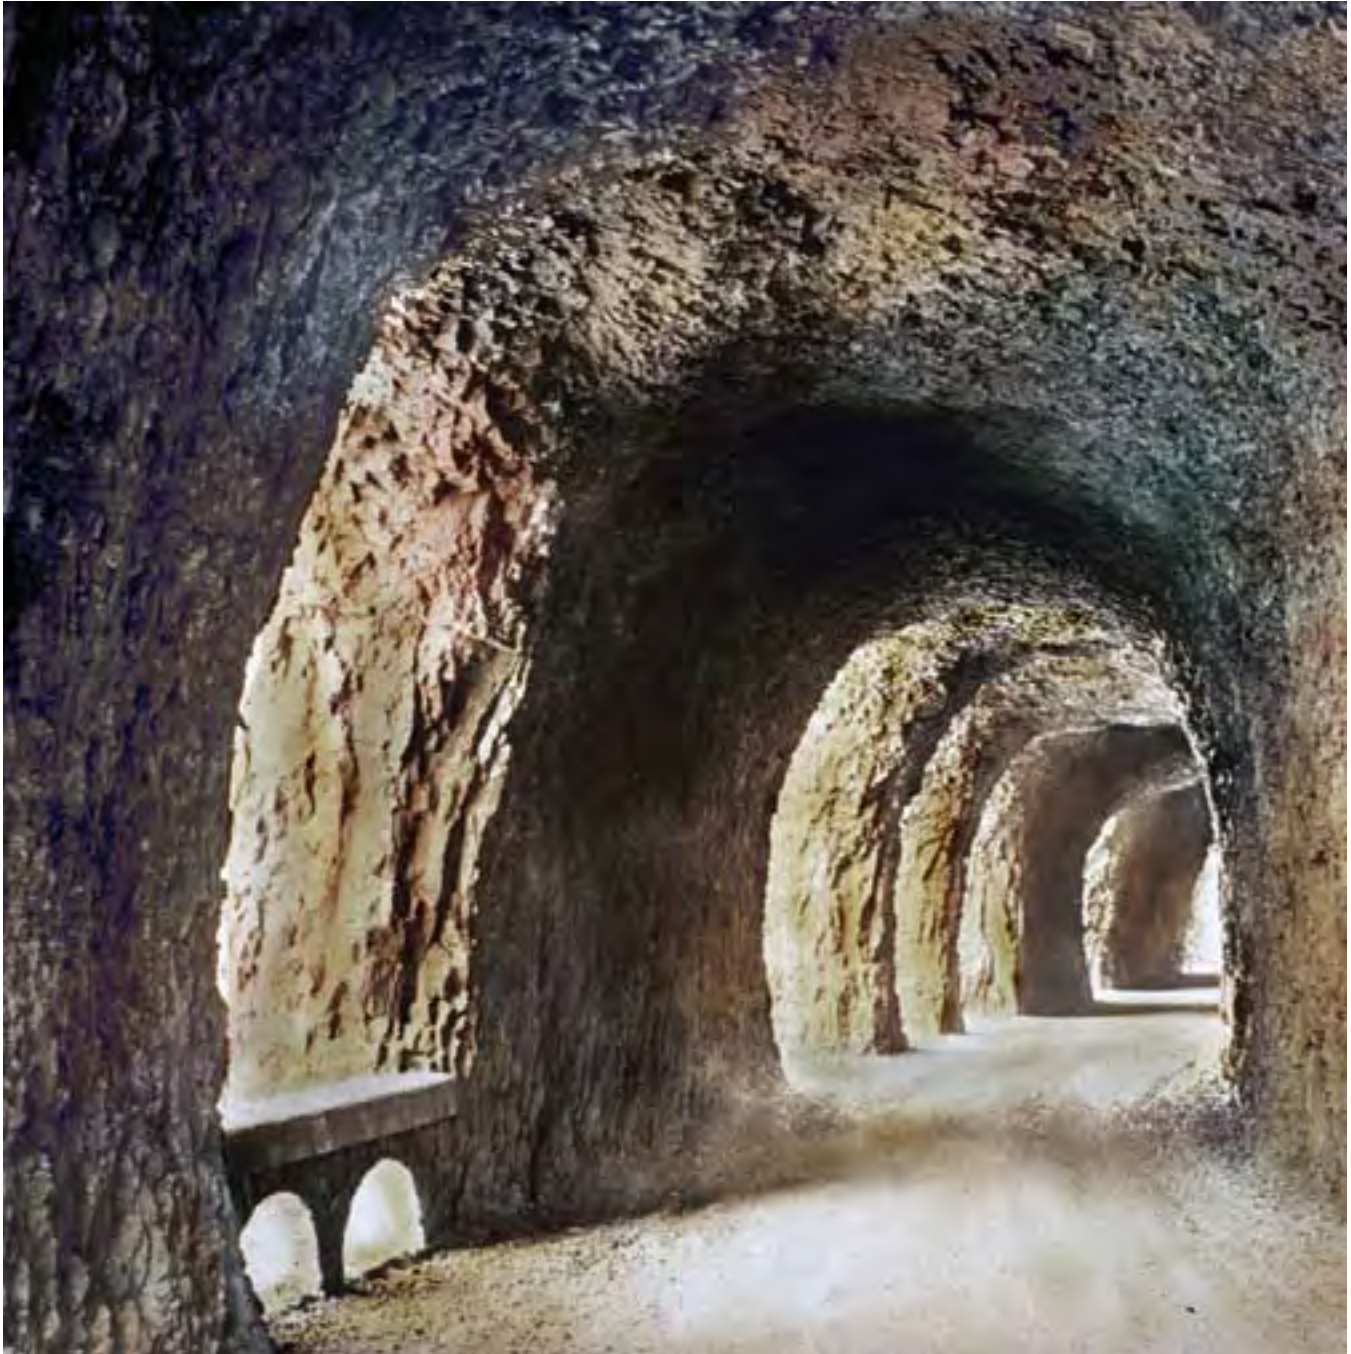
Mitchell Point Tunnel—The Tunnel of Many Vistas
